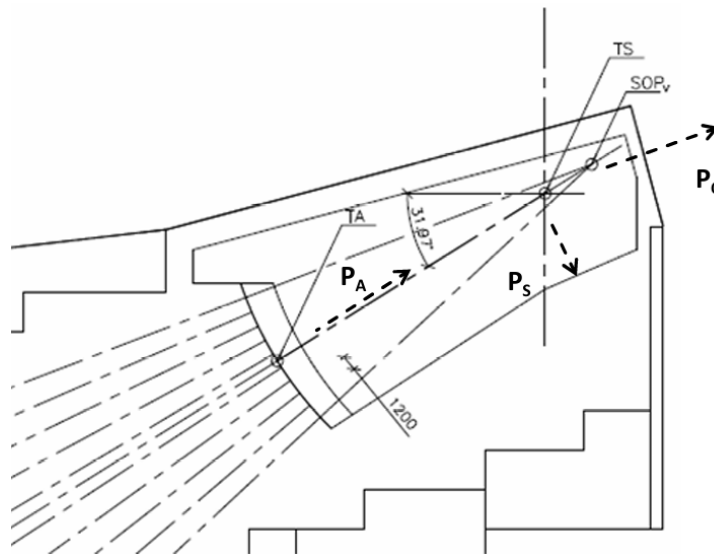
Resulting Cable Forces Acting on Sicilian Anchor Block
